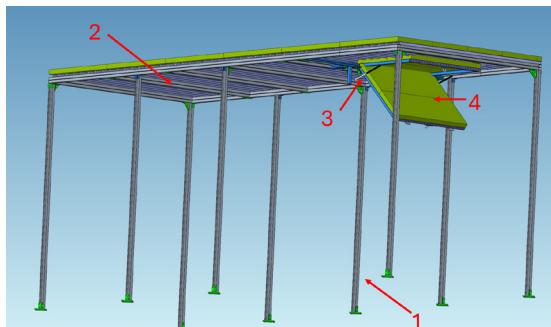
Klystron Enclosure. 1 - galvanized steel supports; 2 - corrugated stainless steel B-deck; 3 - gas spring; 4 - trap door (using Rockwool comfort board 80).
